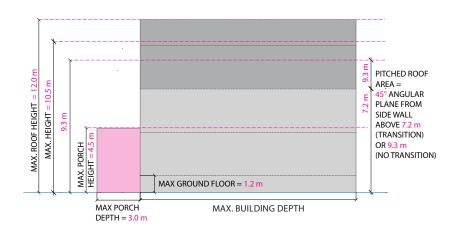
SIDE ELEVATION WITH FRONT PORCH
